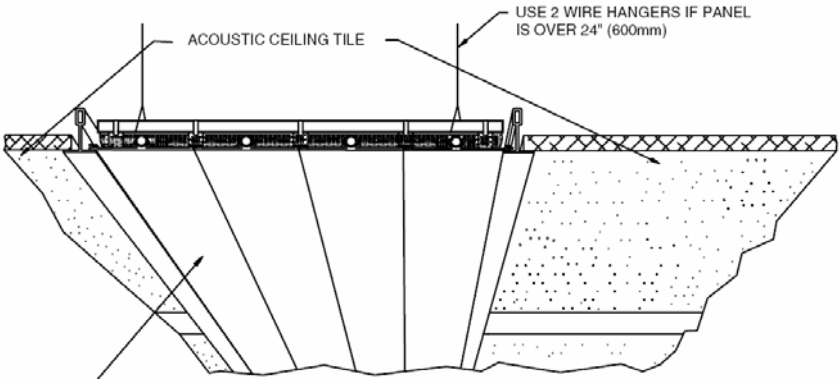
E. Smooth Face Linear Extrusion Panel Type D by Sterling.
